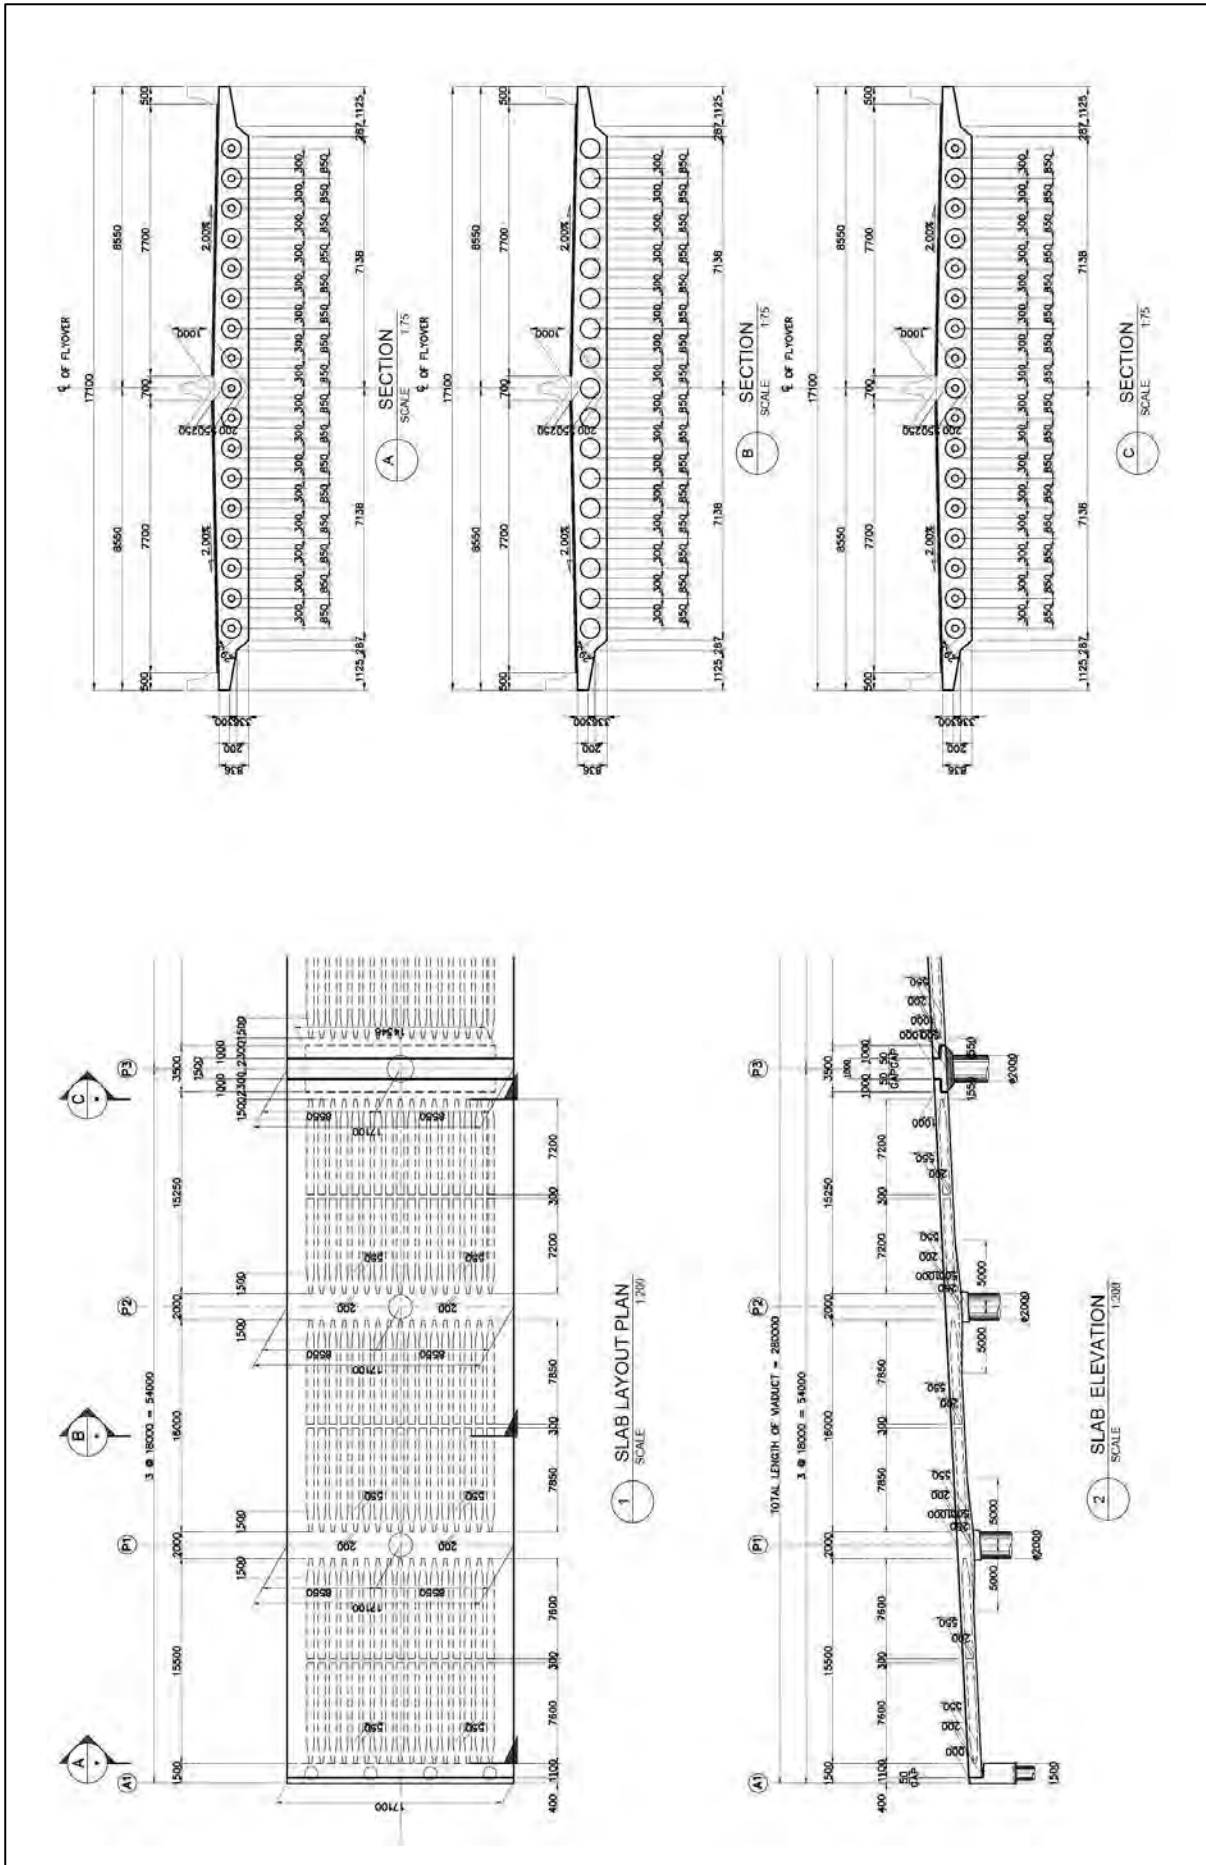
Slab Layout Plan (1/2) (C-3/E. Rodriguez Interchange)
